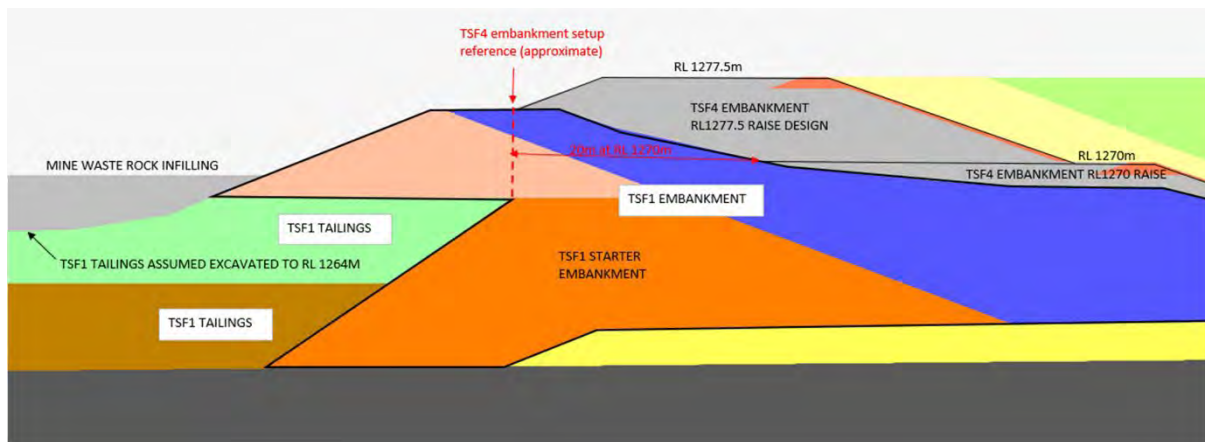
TSF4 Cell 1 Northern Embankment Arrangement
